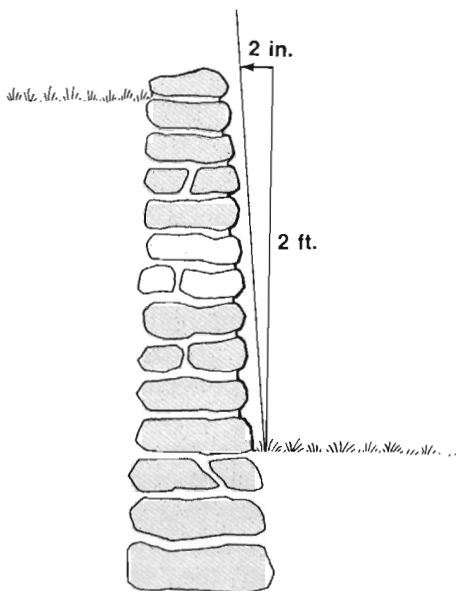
A rock garden wall should slope backwards 1 inch for every vertical foot.
